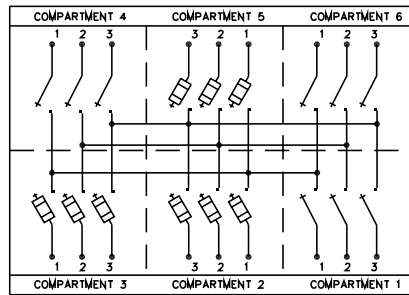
One incoming switch and five fused feeders
